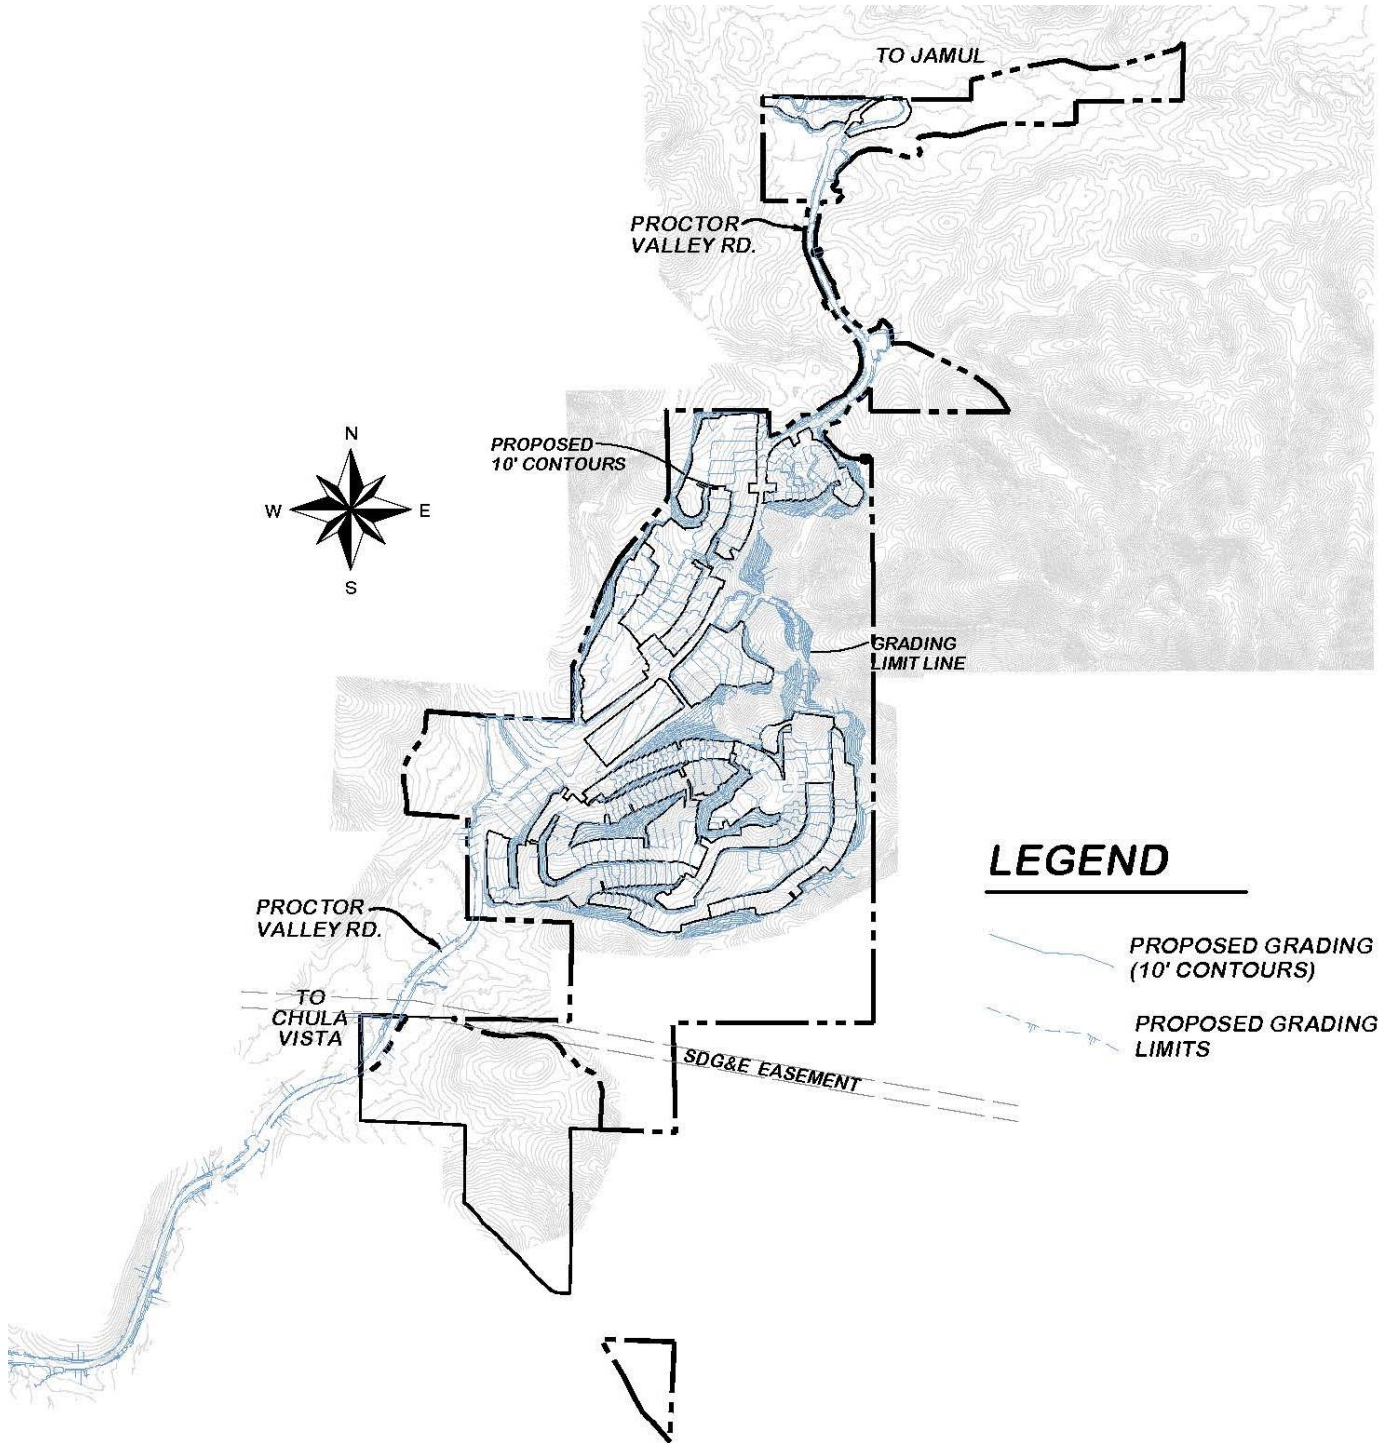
Proposed Project Amendment Conceptual Grading Plan
